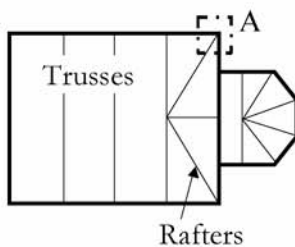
Walls hammered by roof rafters [Do 94].
